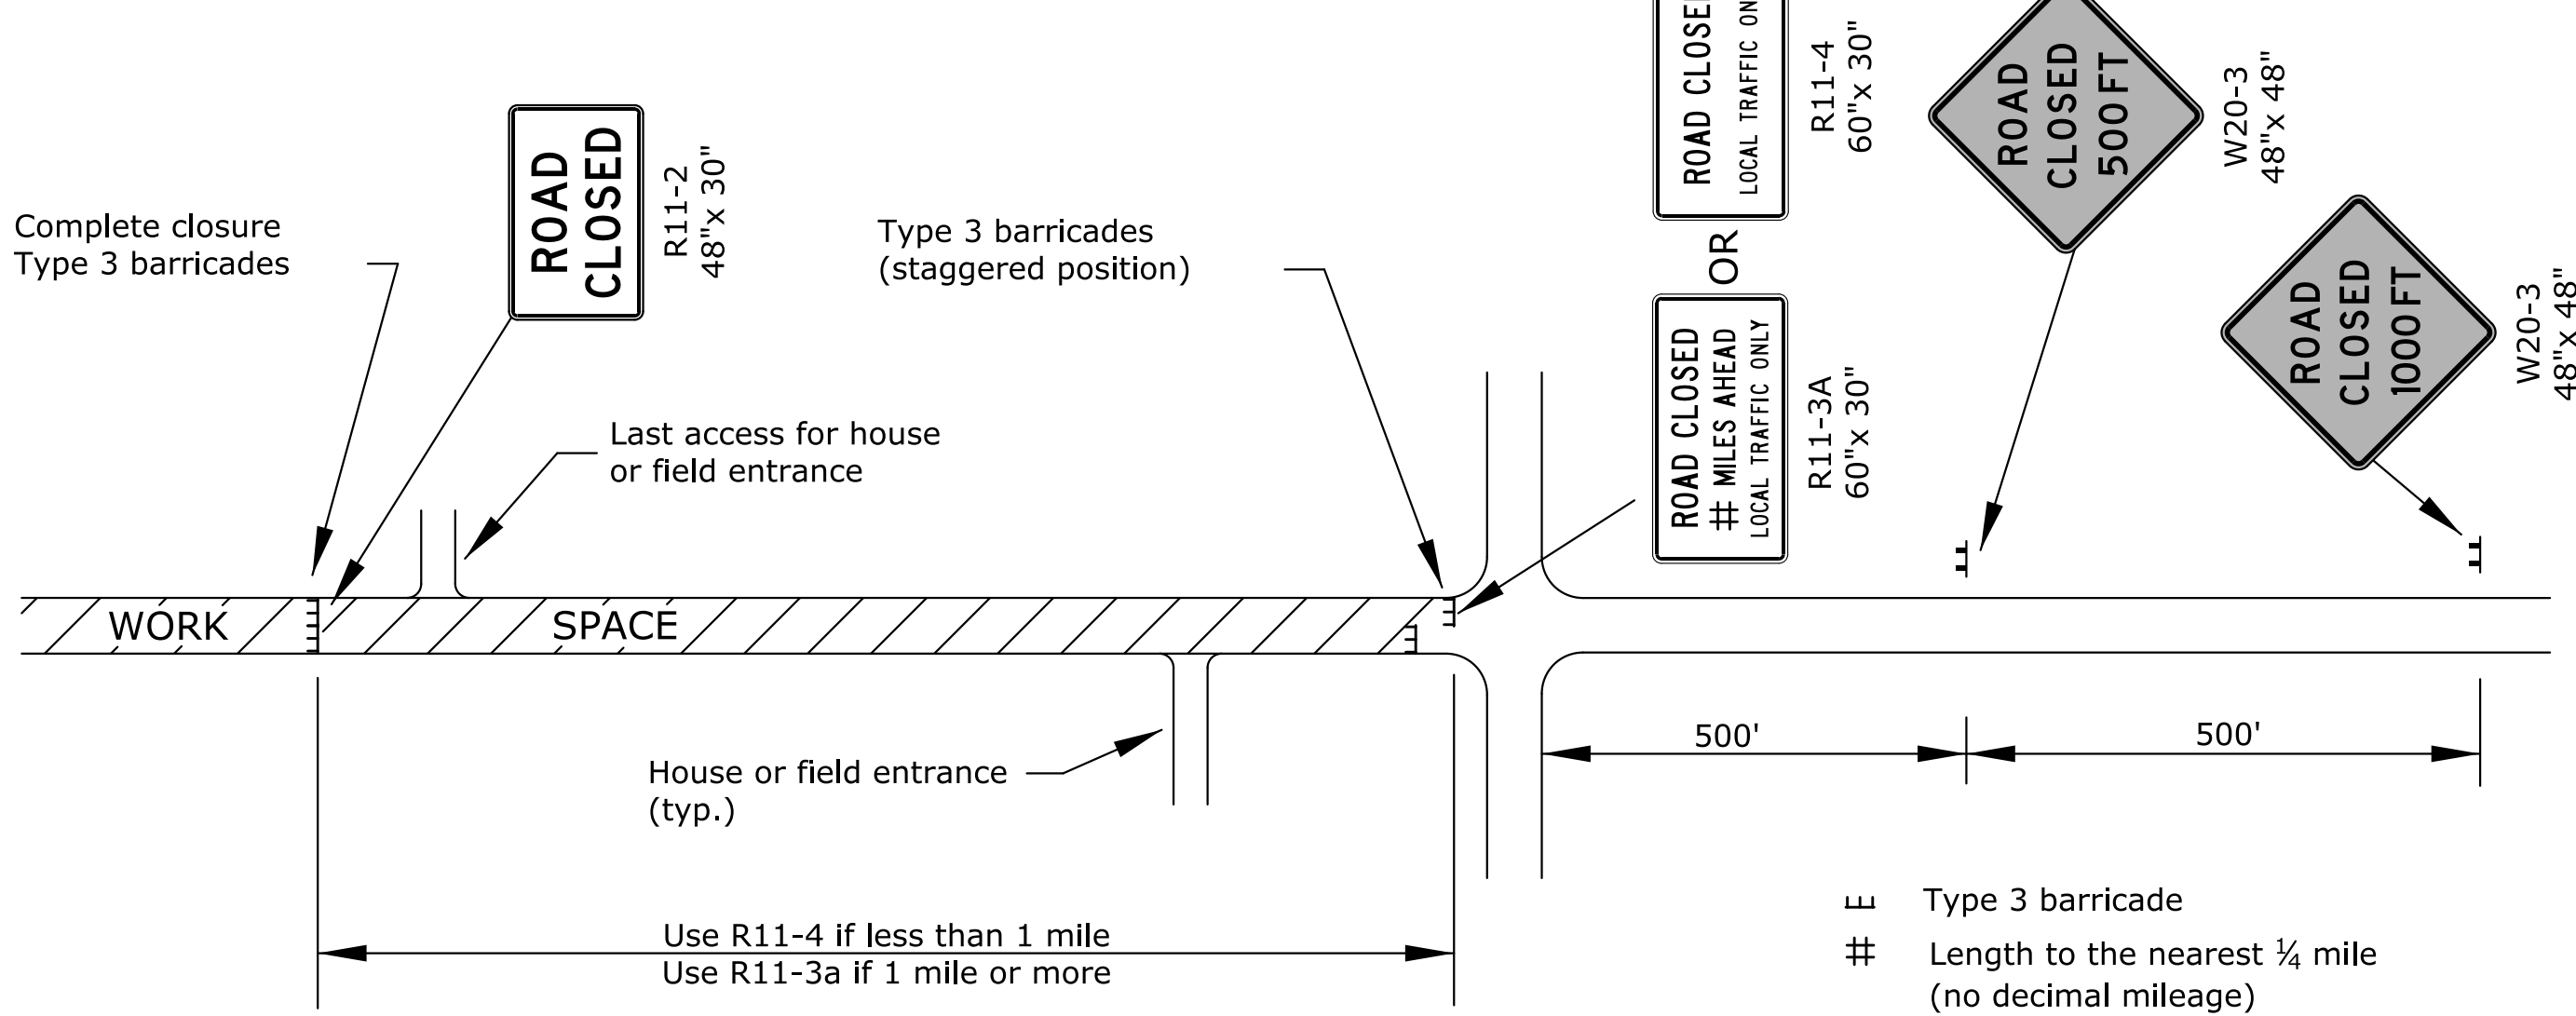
TYPICAL SIGNING FOR ROAD CLOSURE - LOCAL TRAFFIC ACCESS
